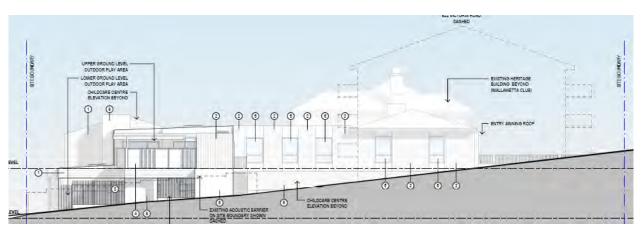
South-eastern (side) elevation facing 820 Victoria Road (note 822 Victoria Road shown hashed outline).
